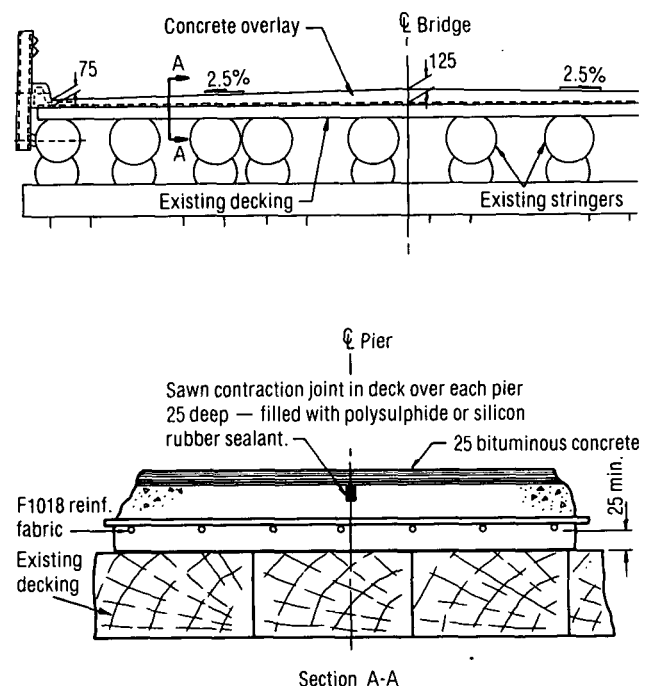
DETAILS OF CONCRETE OVERLAY
